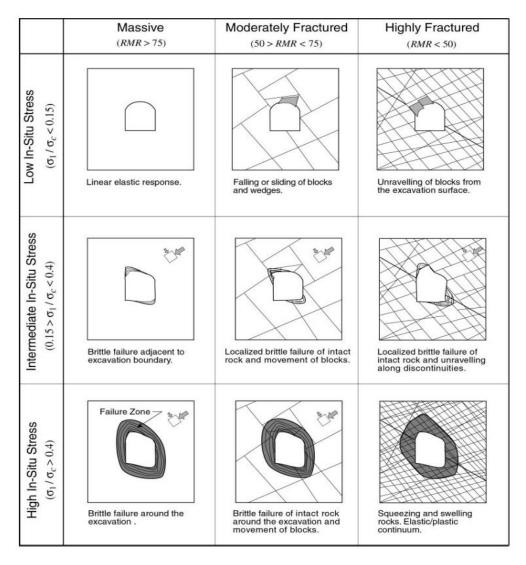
Different modes of rock failures in an underground opening (Kaiser et al., 2000)
